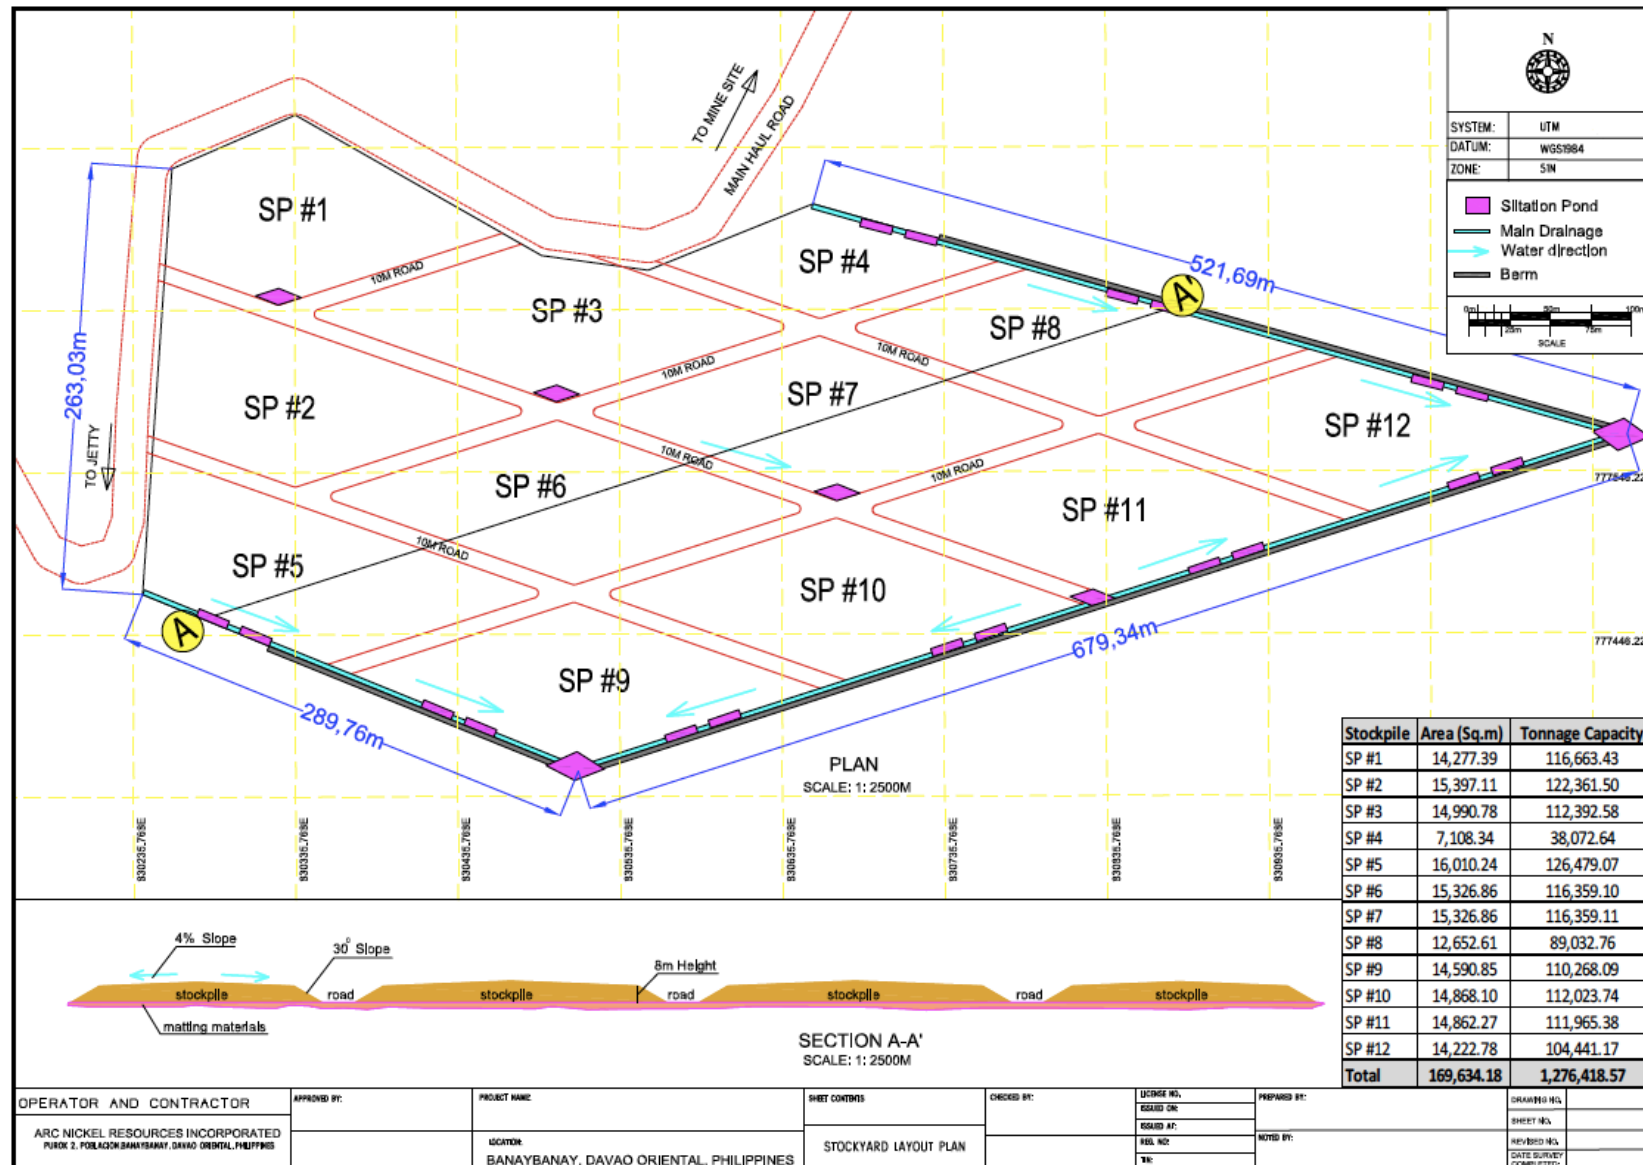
Layout of Stockyard Layout Plan (Source: RCMC)
